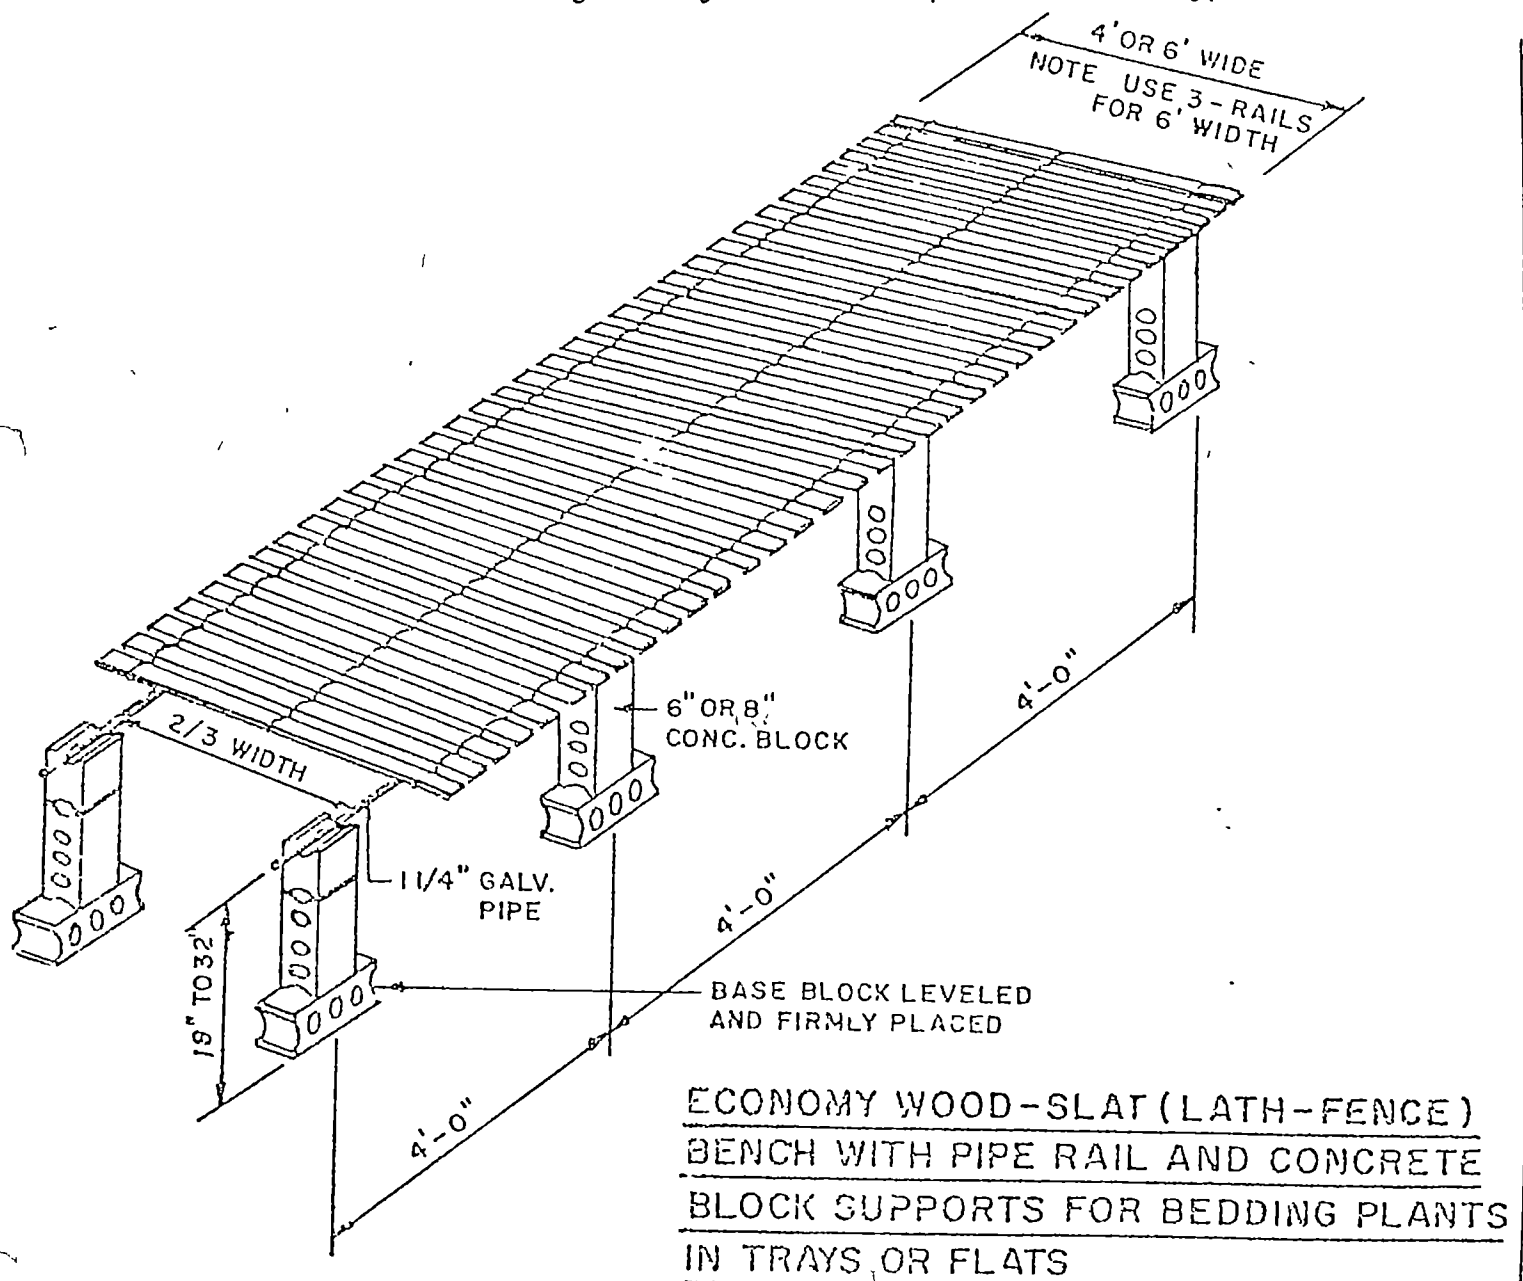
Economy lath-fence bench with pipe rail and concrete block supports for bedding plants in trays or flats.
